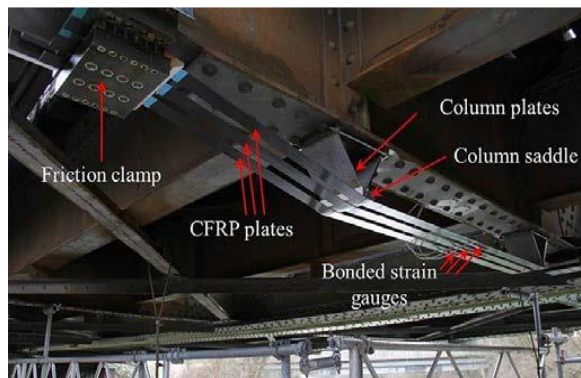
Steel bridge retrofitted using CFRP strips (Sonnenschein, Gajdosova, & Holly, 2016)
